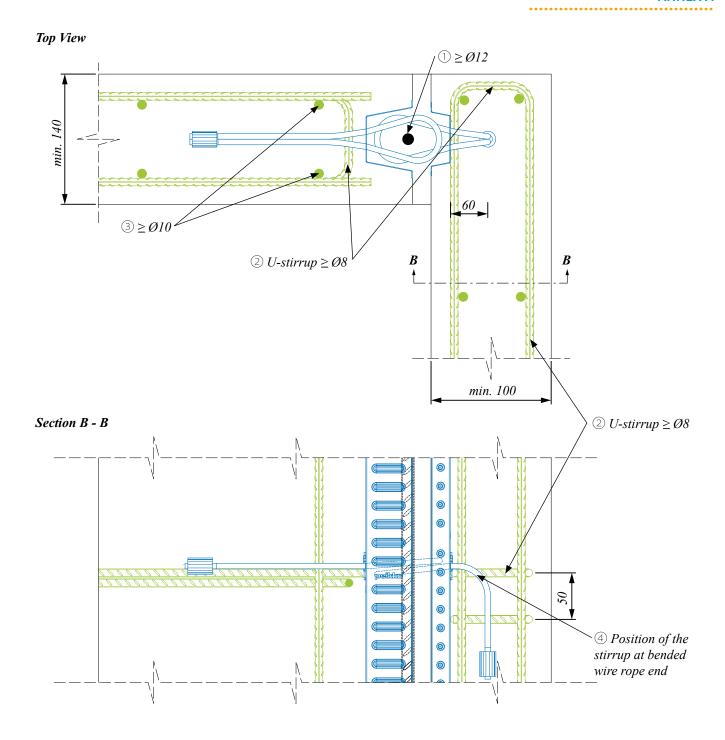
Reinforcement at wall end with WILORA® 20 + WILORA® 50 Connecting Rails.
